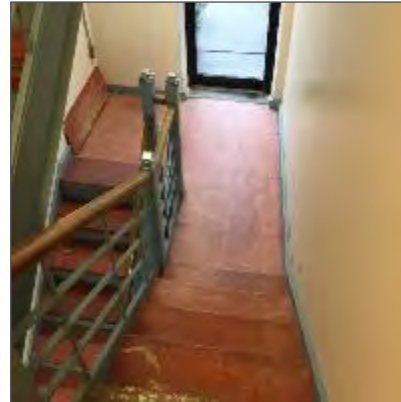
Non-asbestos vinyl flooring, red with white streaks, Main Stairwell.
